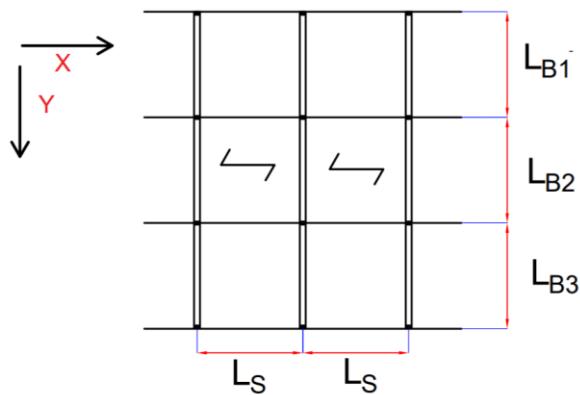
Structural scheme for Cocoon/Combination Office with HCS floor system.
